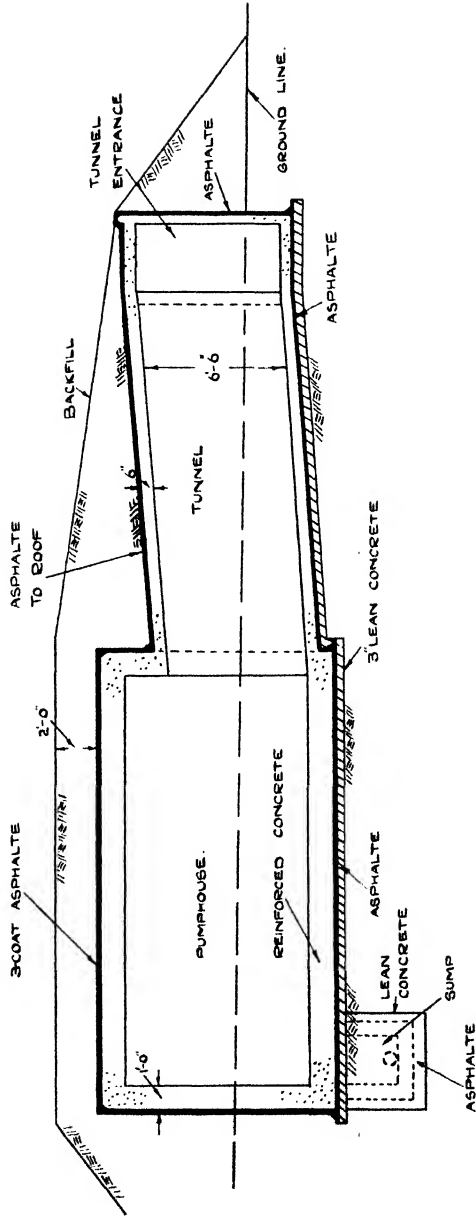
TYPICAL WATERPROOFING TO BURIED STRUCTURE
